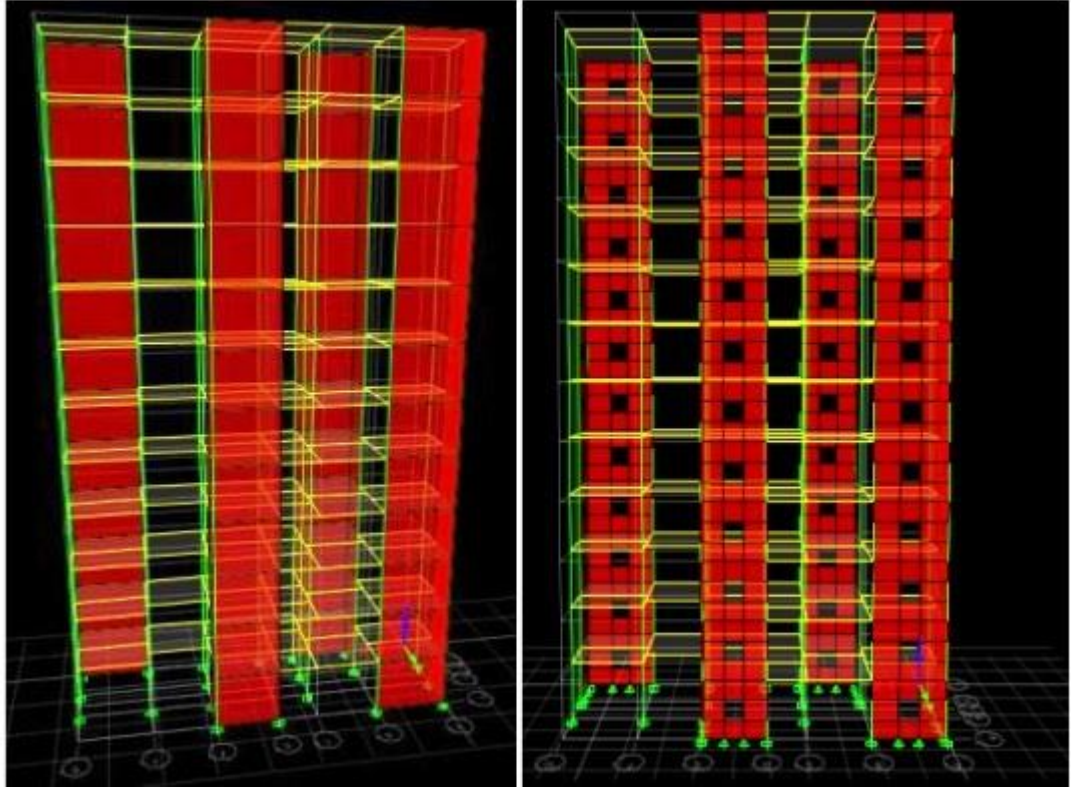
Elevation of shear wall building (Yarnal. S et al (2015))
